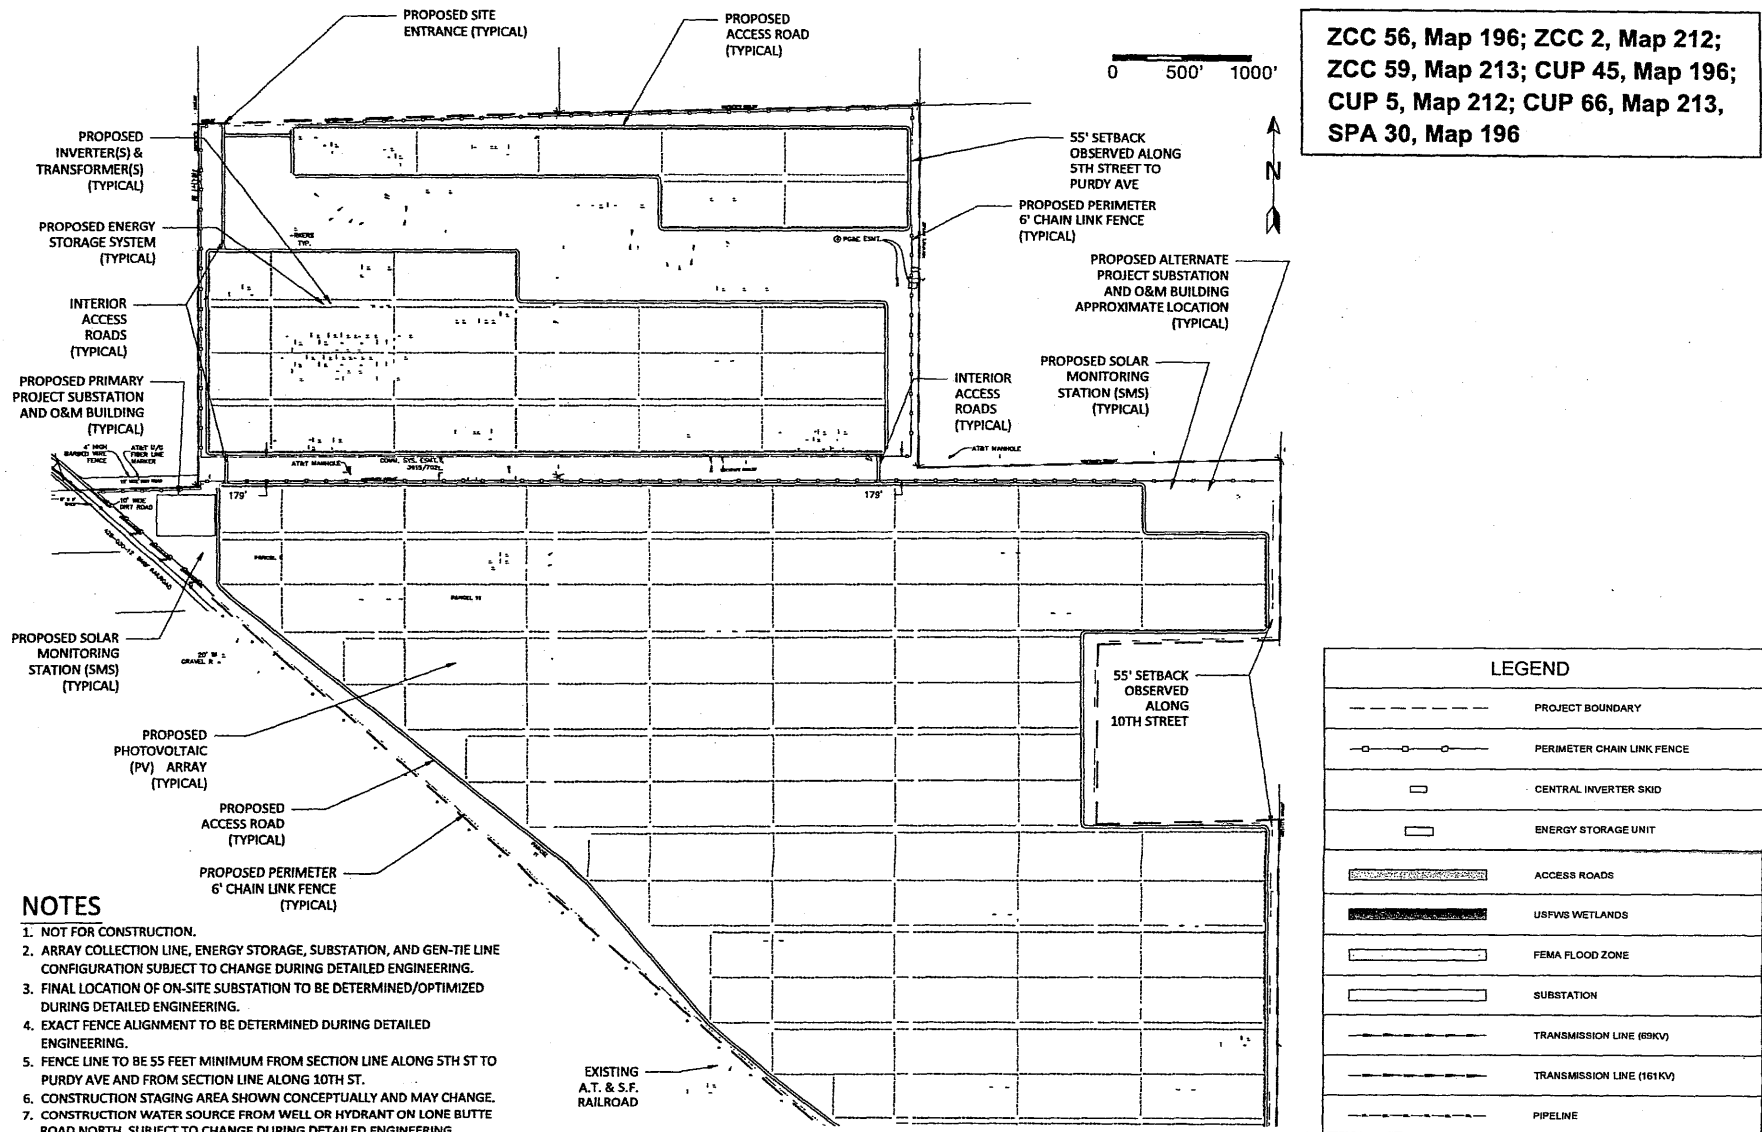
A: NORTHERN SITE PLANS - PART 1
